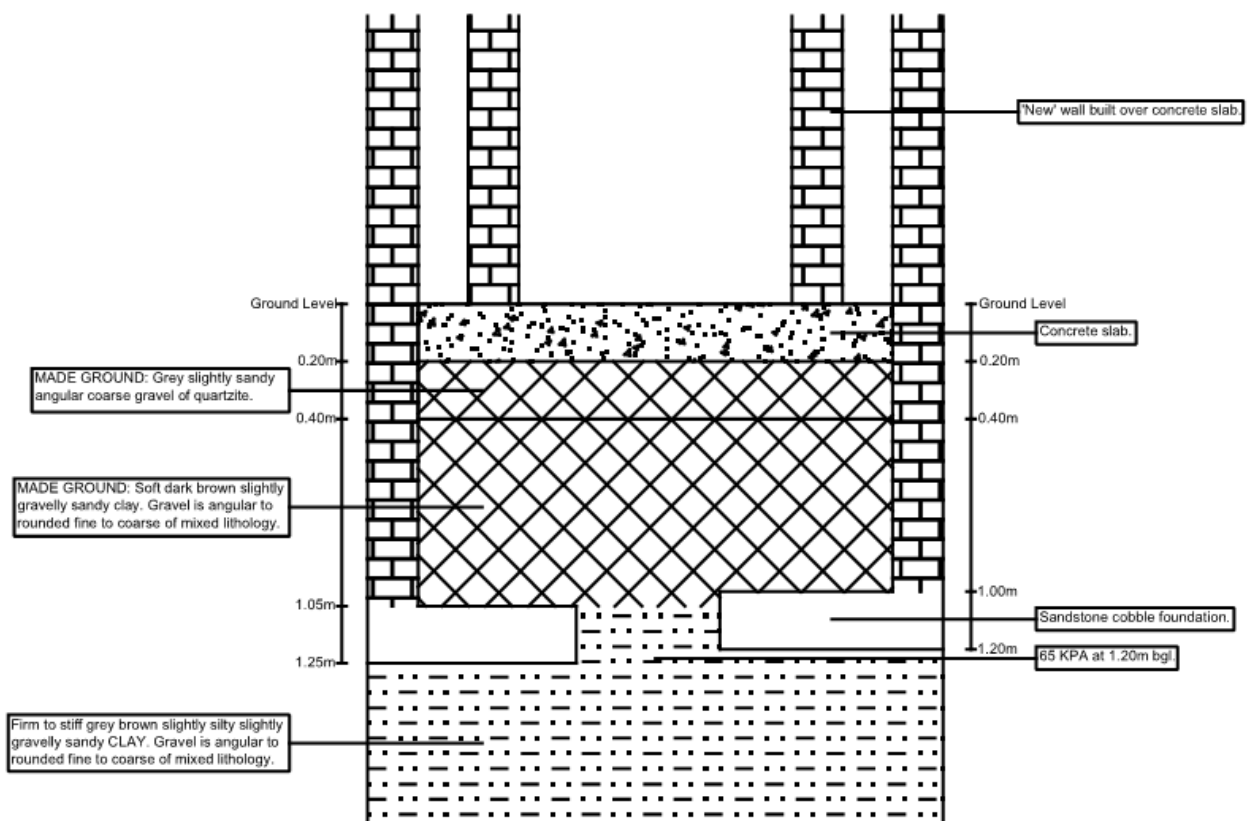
Internal Corridor Foundations (Groundtech sketch)
